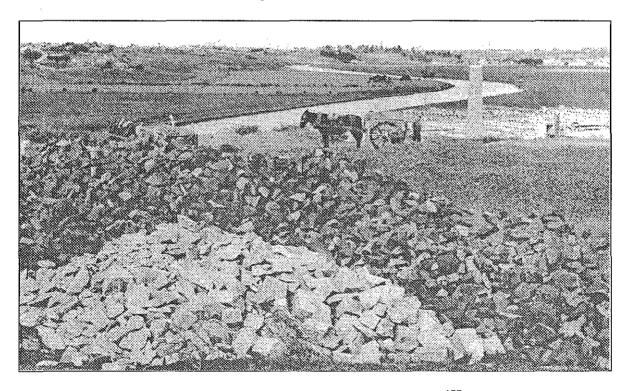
Stone cart and spalls at quarry above the pipe factory c.1920. 177
